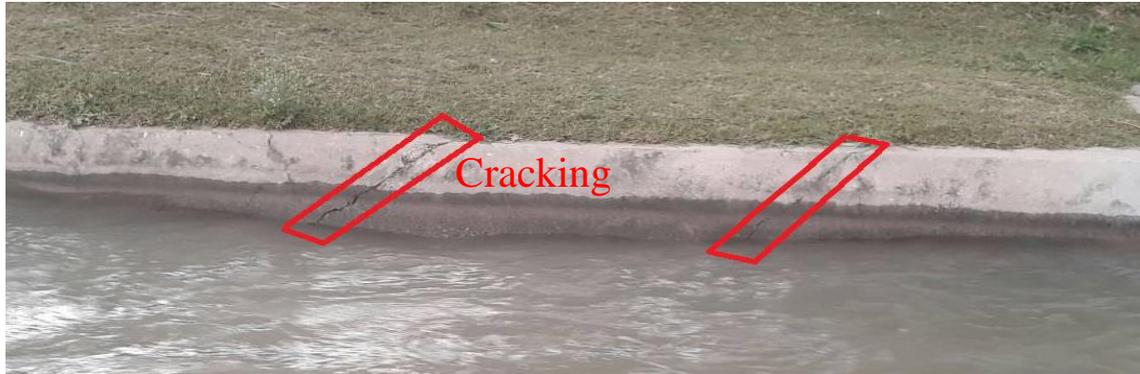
Observed cracks in concrete canal-lining of Ismaila distributary
